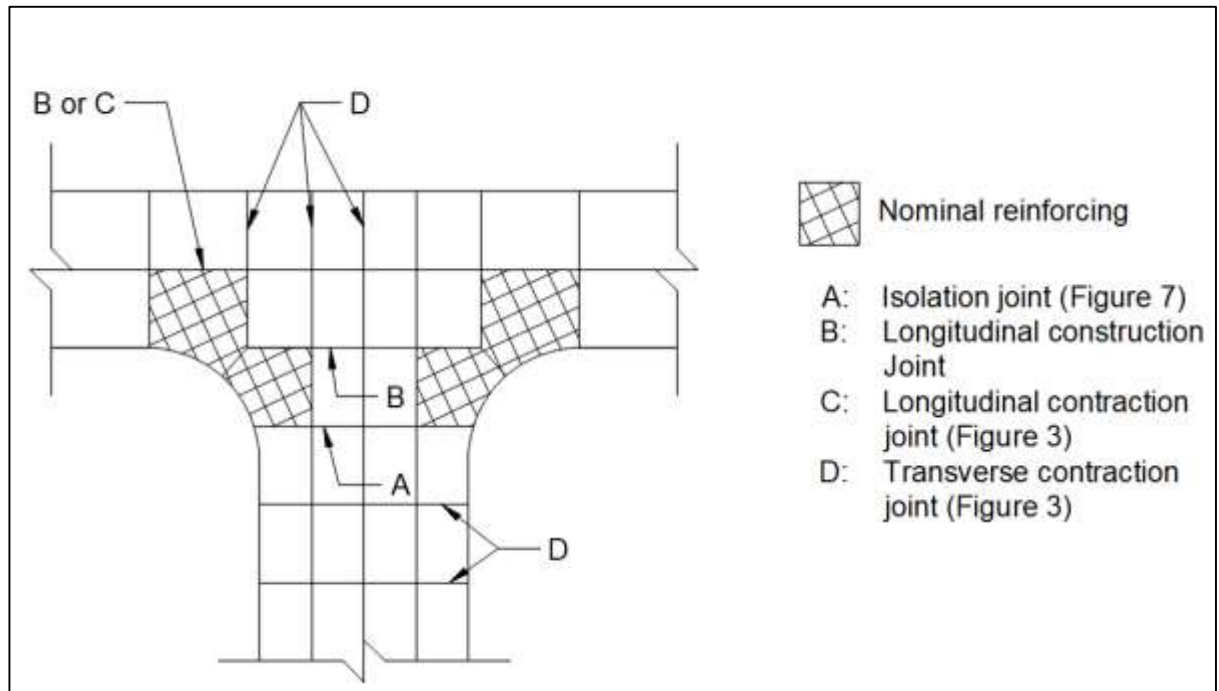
Joint layout and details for odd shapes and intersections (Perrie, 2000)
